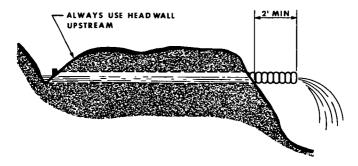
Culvert extended beyond fill to prevent erosion.
